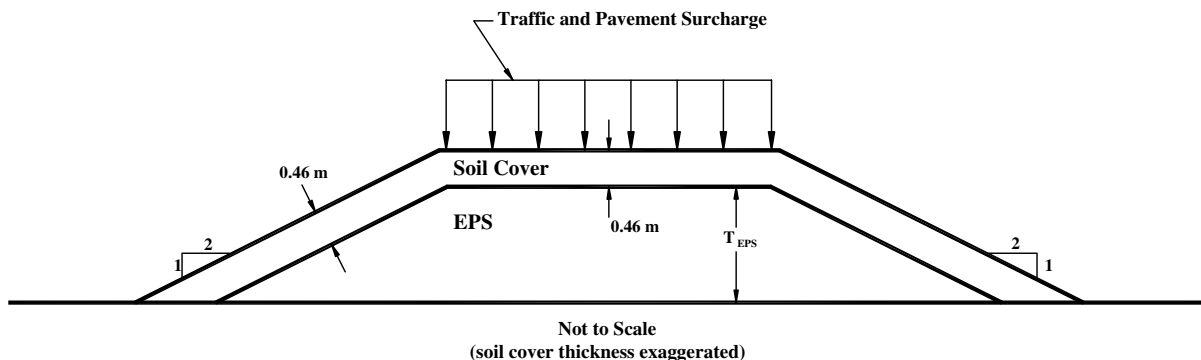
Typical cross section used in static external slope stability analyses of trapezoidal embankments.
